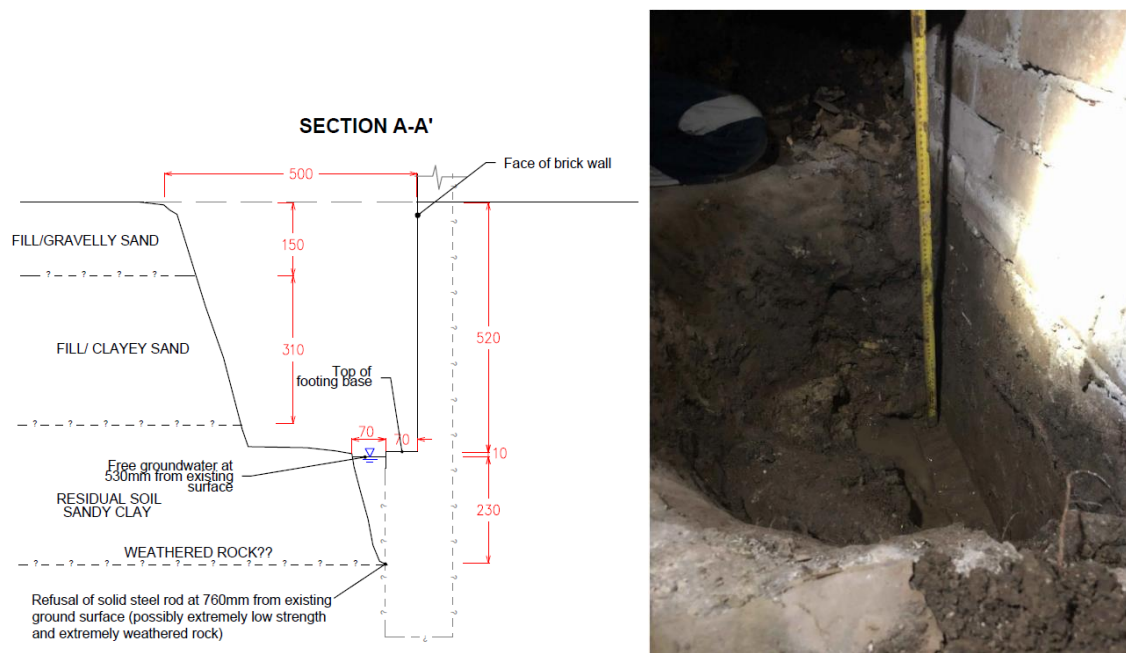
Test Pit 12 Section and Image (Source: Douglas Partners 2019)
